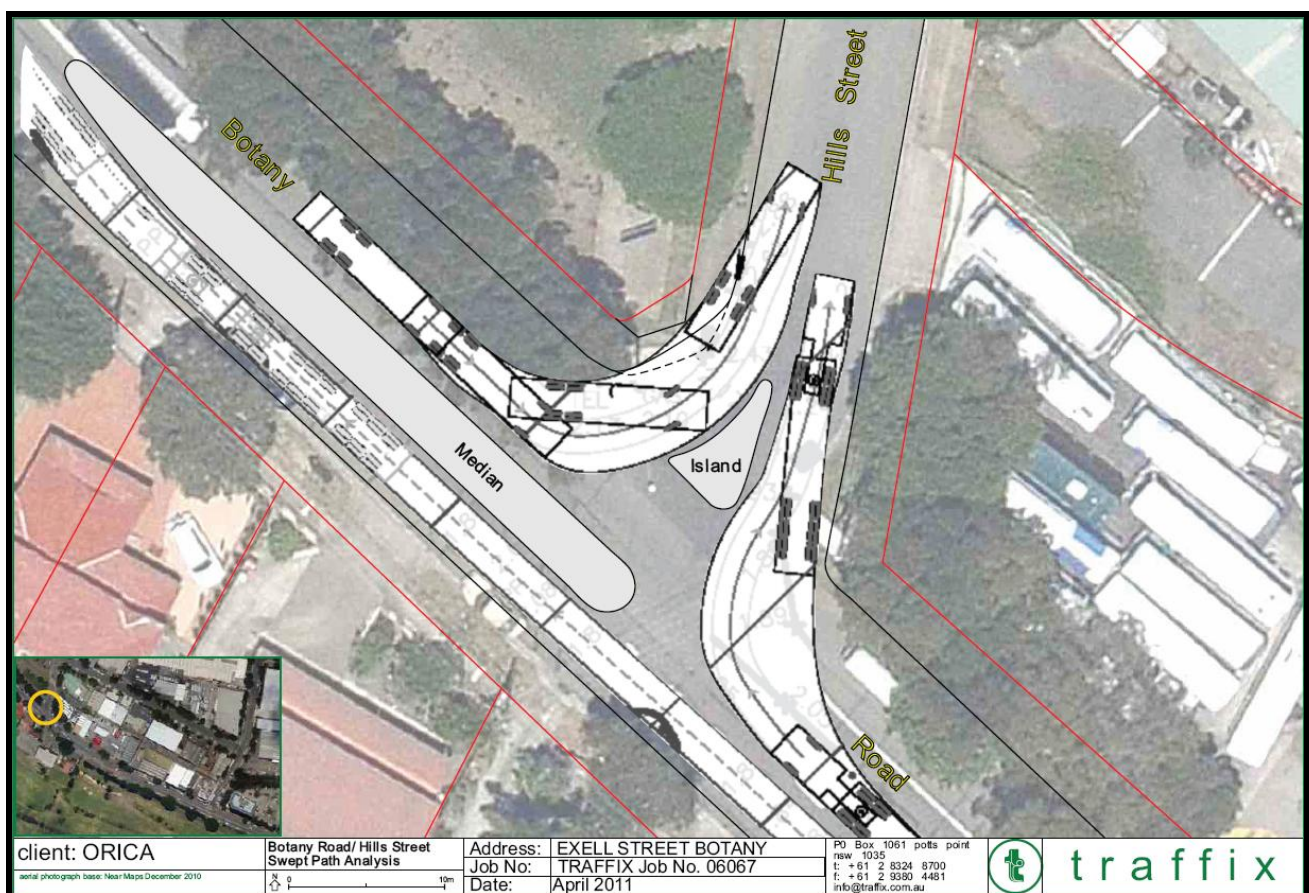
Orica's Proposed Hill Street Intersection Layout
